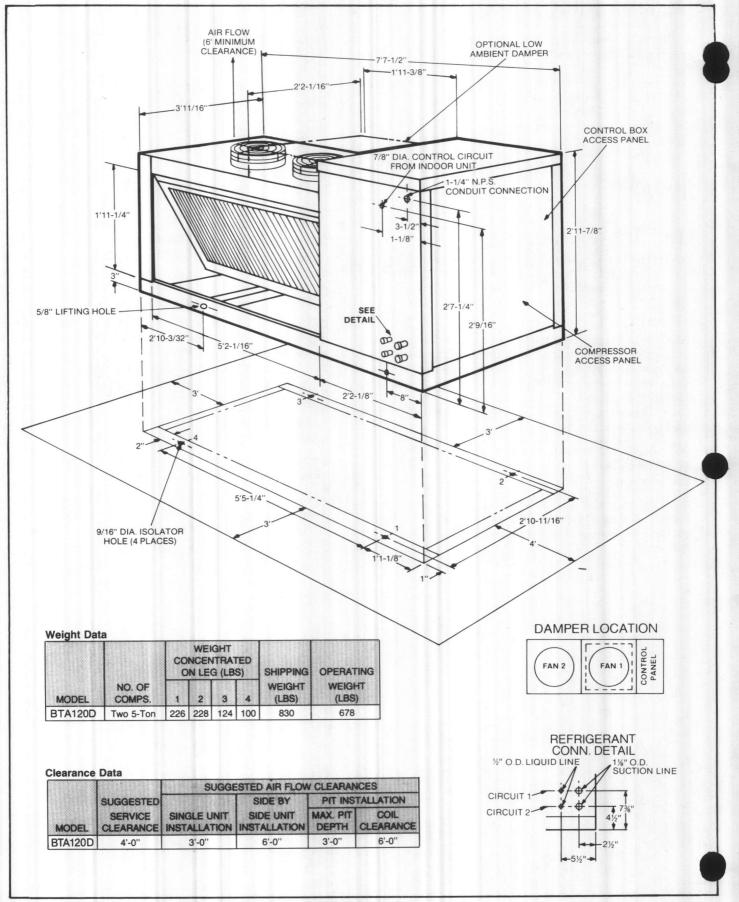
Dimensions, Weights, and Clearances for BTA120D Units
